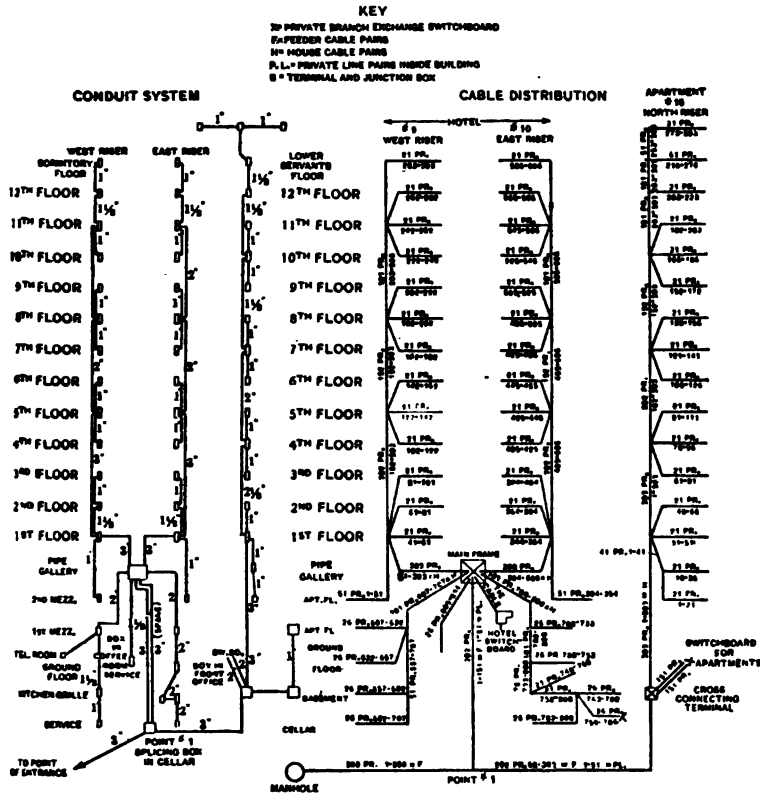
17-STORY COMBINATION HOTEL AND APARTMENT BUILDING, CONDUIT SYSTEM AND CABLE DISTRIBUTION.
